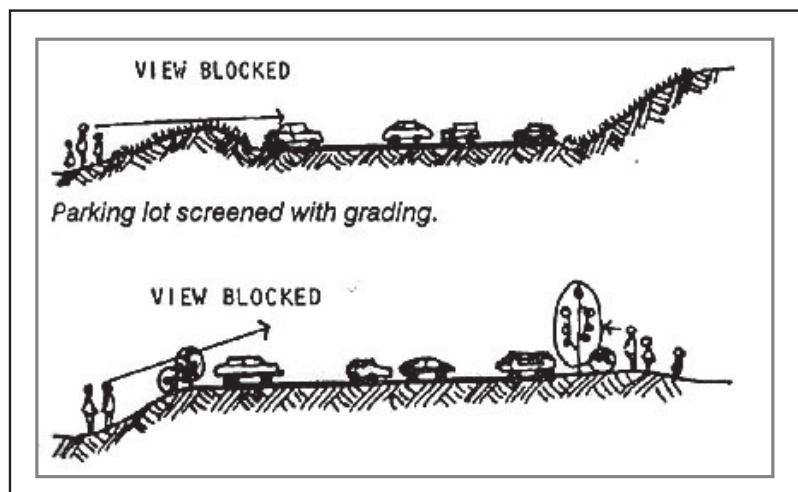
An example of parking lot screened with plants in a park³⁸
